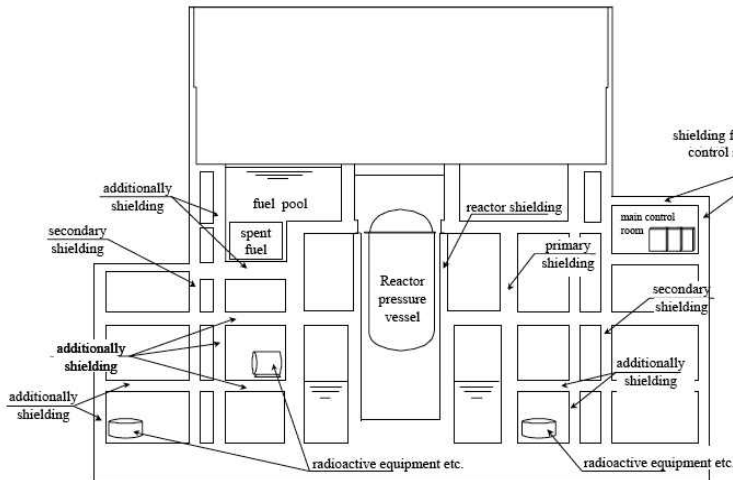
Explanation drawing for summary of shielding type (BWR)
